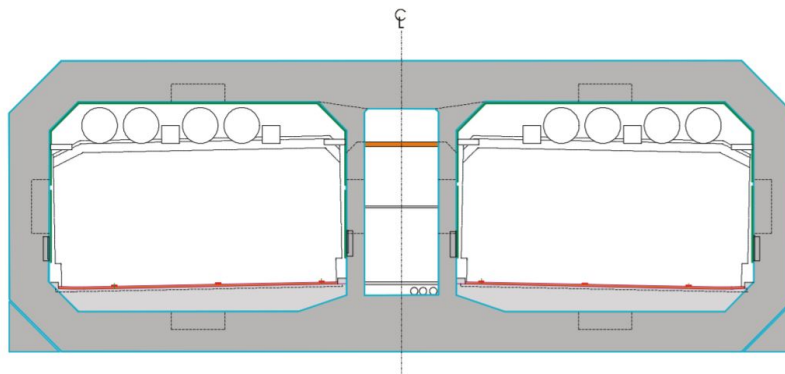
Typical cross-section of reinforced concrete immersed tunnel [5]
